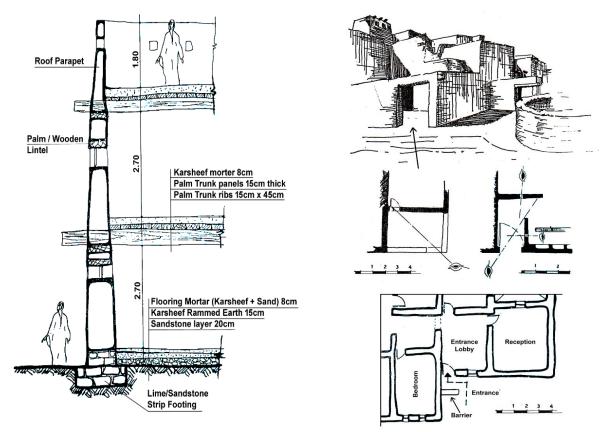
Cross Section in Traditional House. Opening Patterns:
